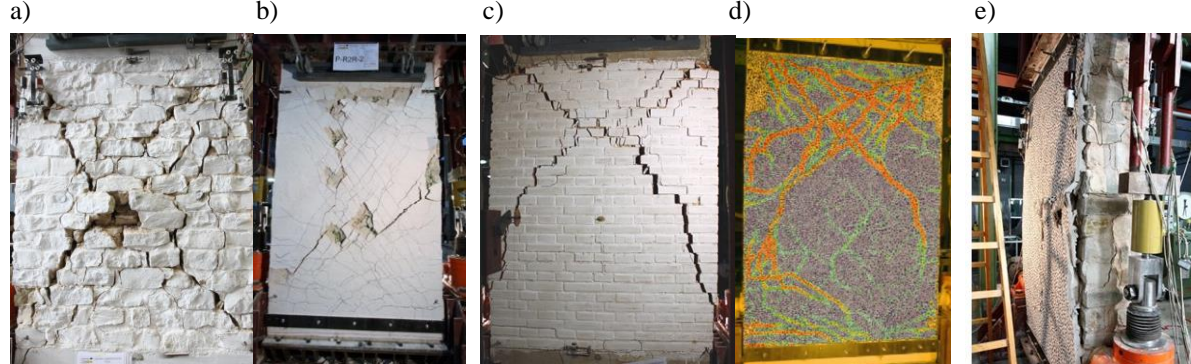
Stone masonry specimen at the end of the shear compression test on unreinforced (a) and reinforced (b) side; brick masonry specimen on the unreinforced (c) and reinforced side (d); detachment of the coating (e)
